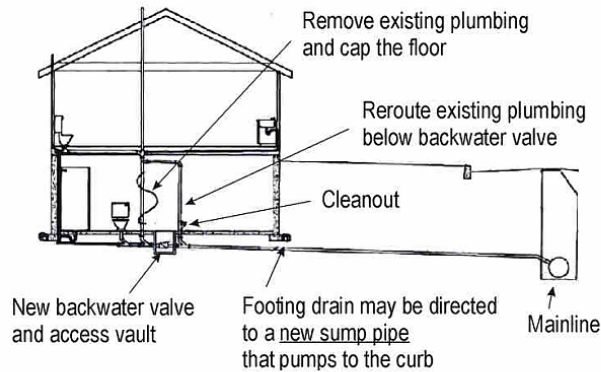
Foundation Drain Disconnection Setup in Duluth, MN.
